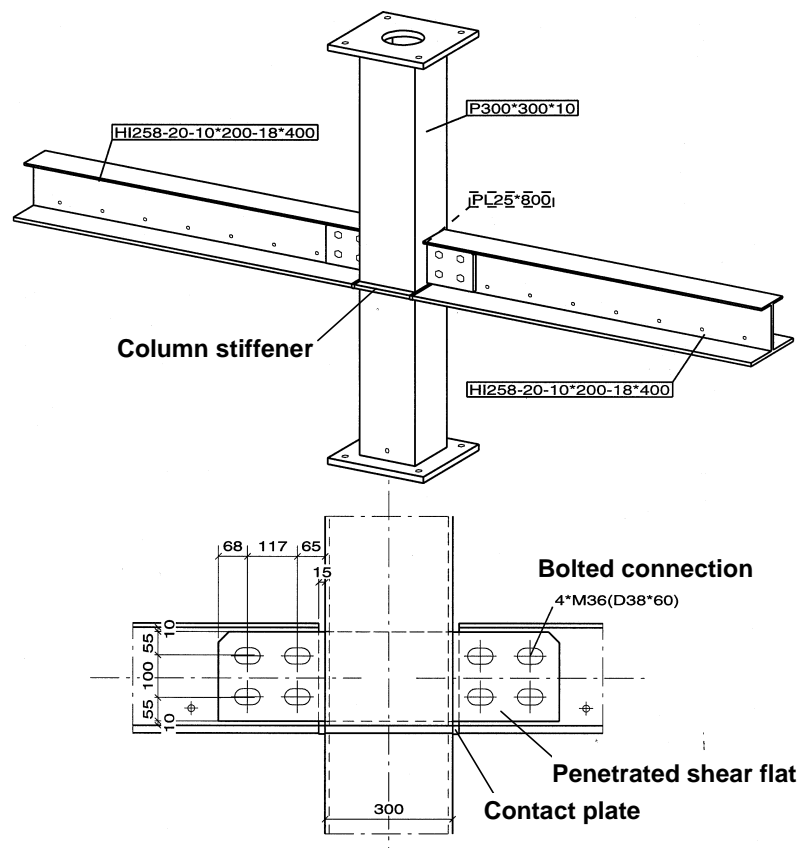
Steelwork connection between asymmetric steel beams and a rectangular hollow steel section.
